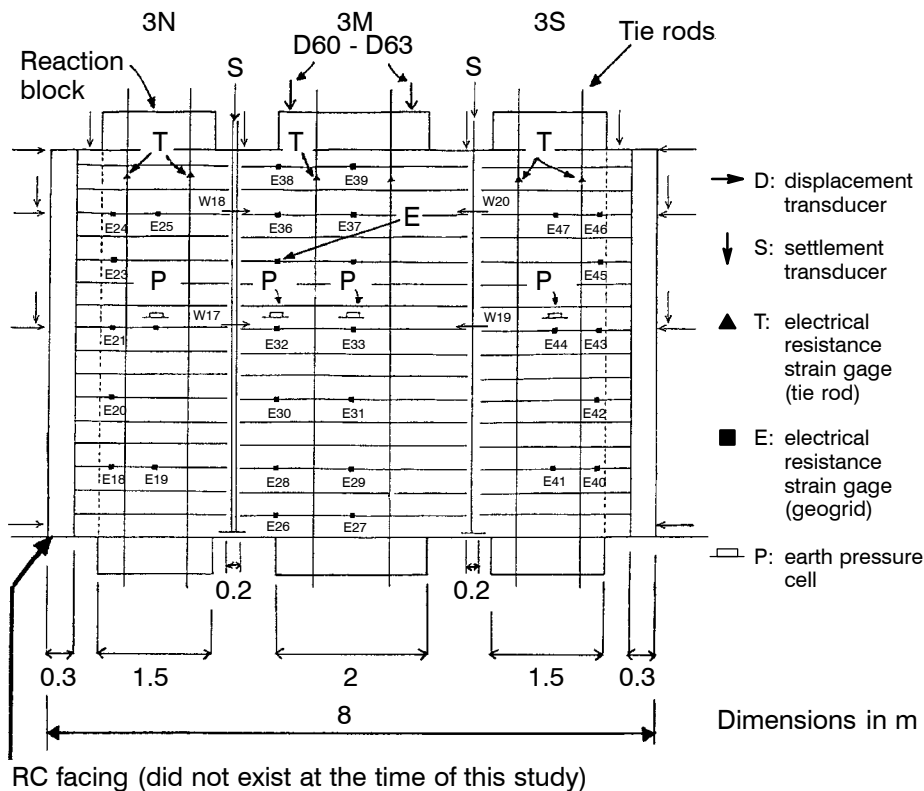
Cross section of the test wall divided into three PLPS GRS test segments (test wall was 5 m high, 4 m deep and 8 m wide).
